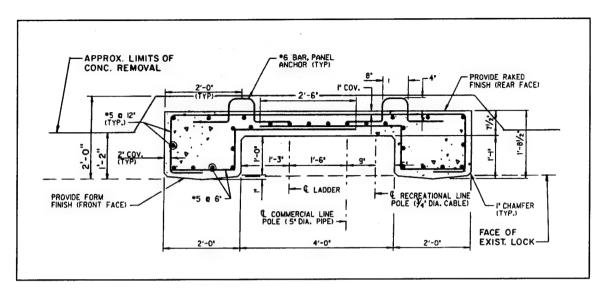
Typical ladder panel section, Troy Lock (from Miles 1993)
